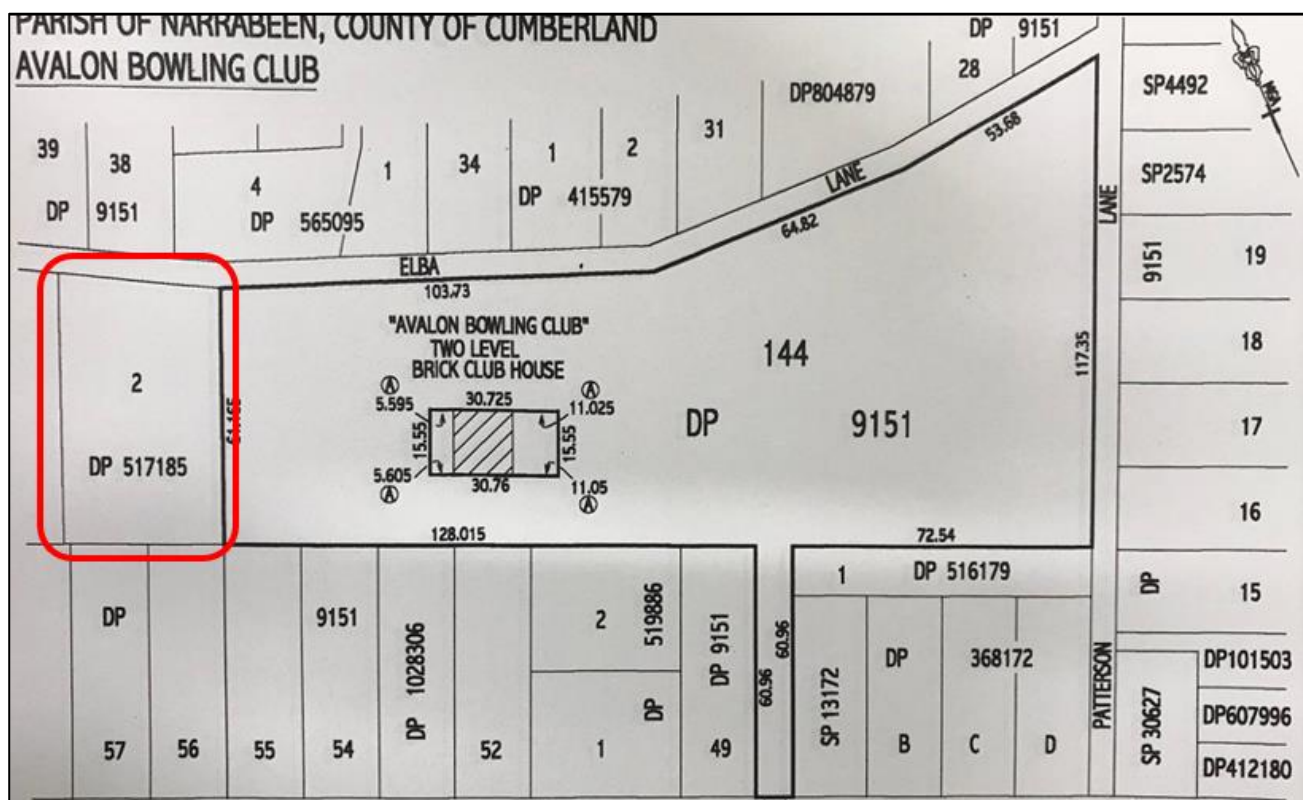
Plan of Subdivision Prior to Consolidation; Highlighted in Red, Lot 2 DP 517185 (Green 3).
